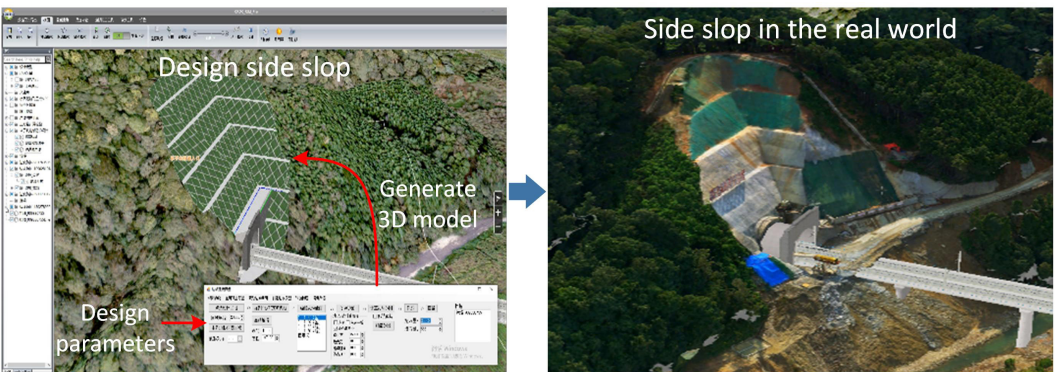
Design of slope protection engineering at the tunnel entrance.
